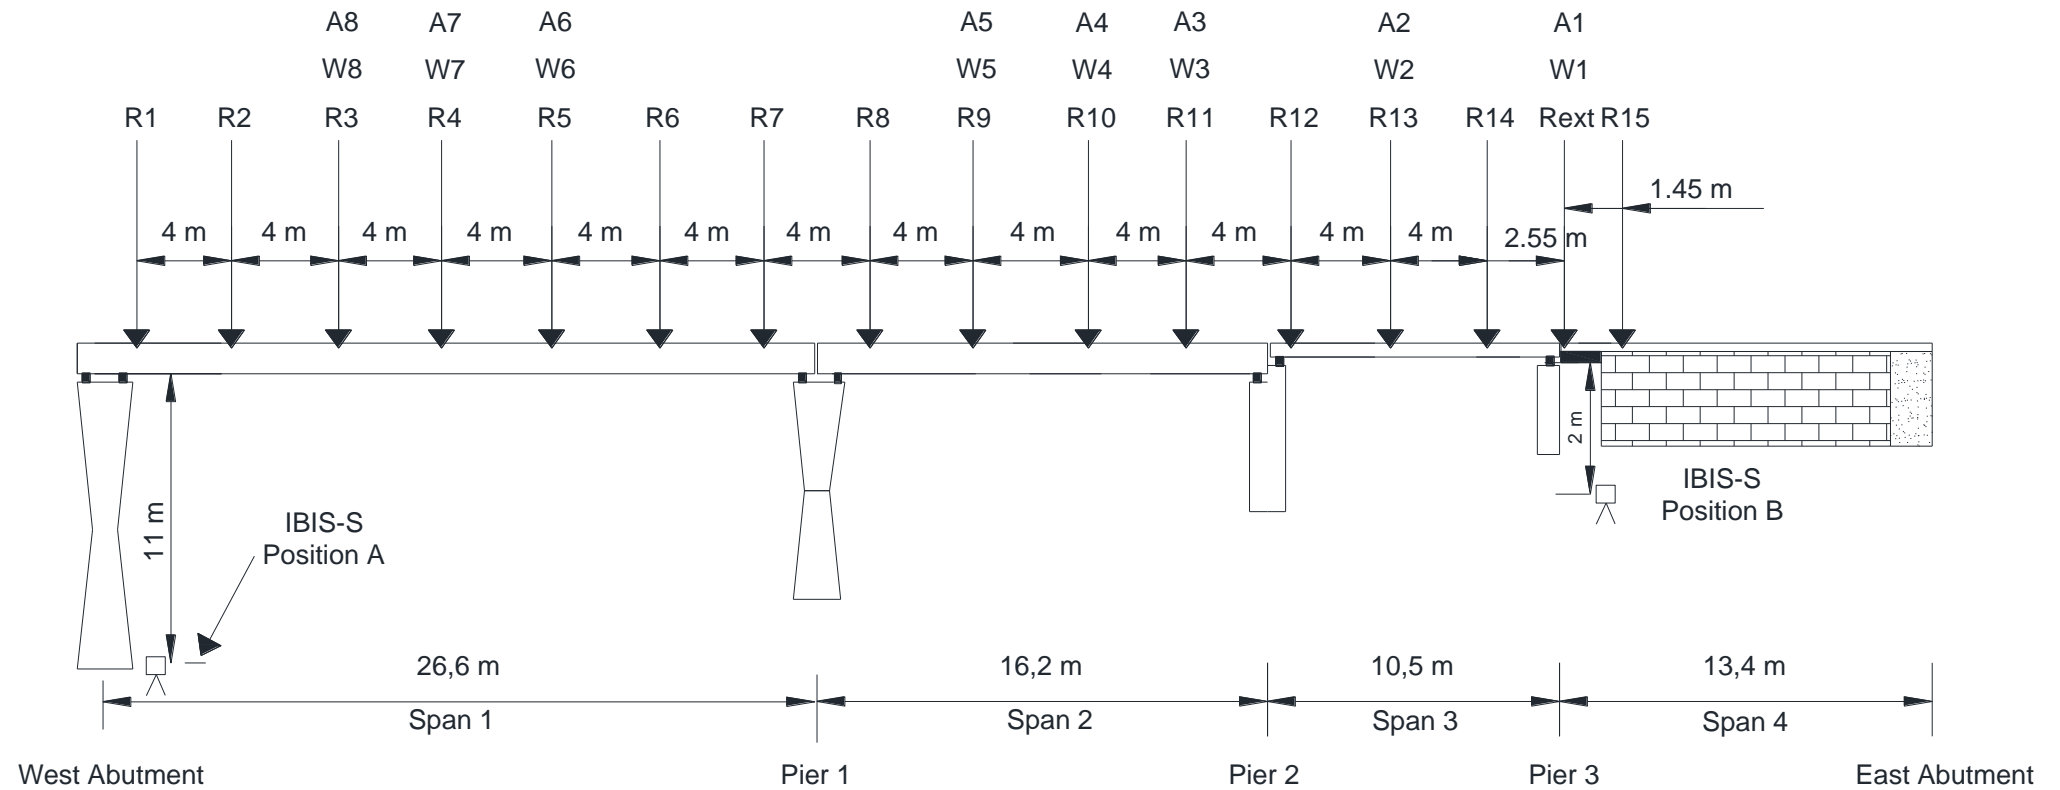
Test Layout plan (not scaled) (Gokhan Kilic, 2010)
